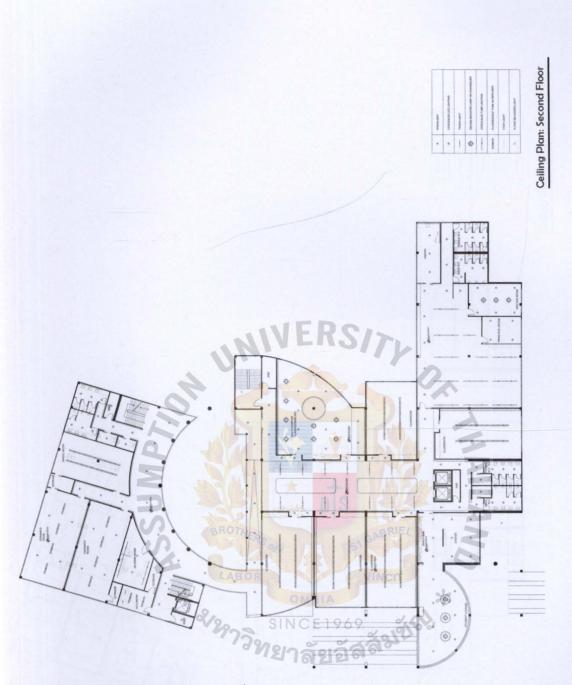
REFLECTED CEILING PLAN: 2<sup>nd</sup>FLOOR
